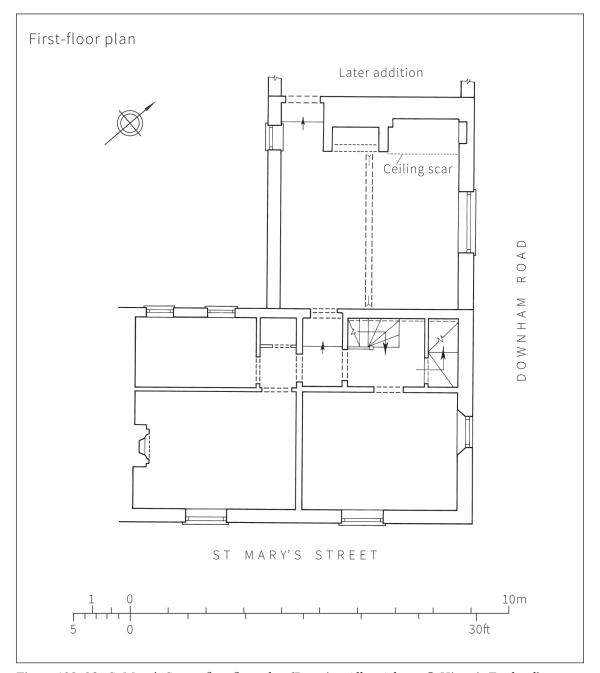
38a St Mary's Street, first-floor plan (Drawing Allan Adams © Historic England).
